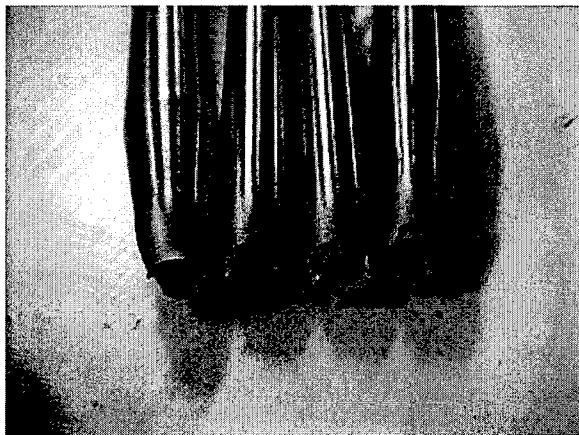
Fracture Surface, Tests 2 and 3
